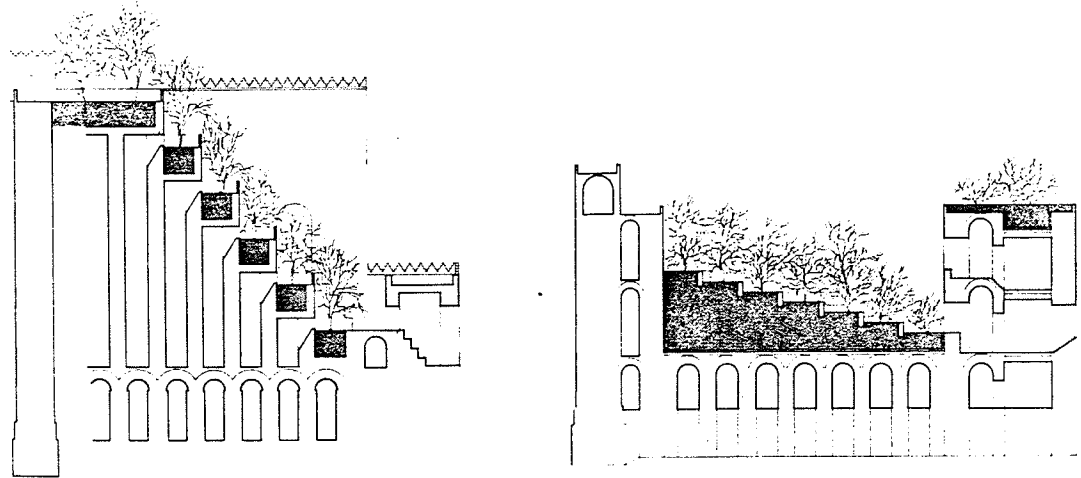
Reconstructed Sections of The Hanging Gardens of Babylon
